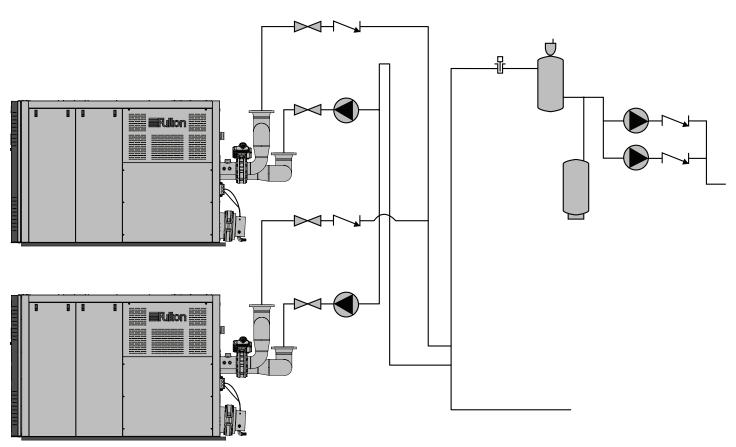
SAMPLE PIPING LAYOUT, PRIMARY - SECONDARY PIPING; MULTIPLE BOILERS
